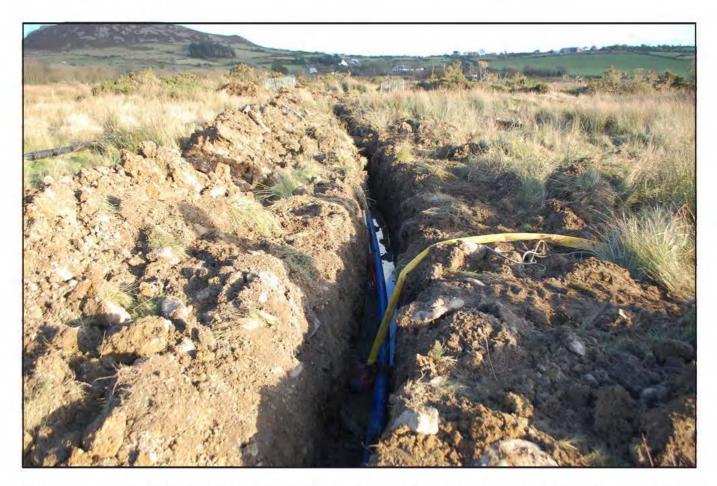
Open cut trench B/Field 7 - view to the East North East showing new pipe in the bottom of the trench. The trench had been waterlogged and was pumped out with a submersible pump which can be seen in the foreground alongside the pipe. The trench was approximately 40 metres long, 0.5 metres wide, and between 1 metre and 1.2 metres deep. Scale = 1 metre.
